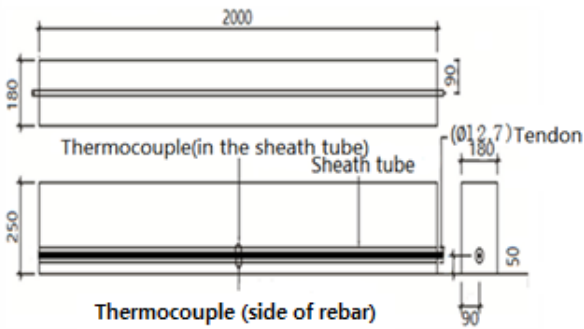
Beam specimen (arrangement of tendon and thermocouples)
